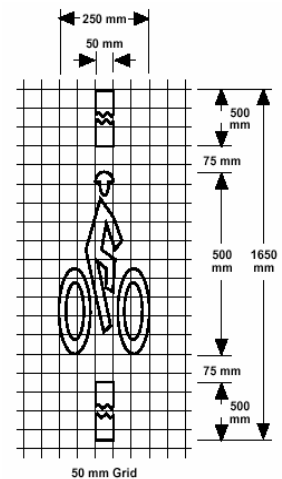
Caltrans Standard Plan A24C bicycle detection marking
